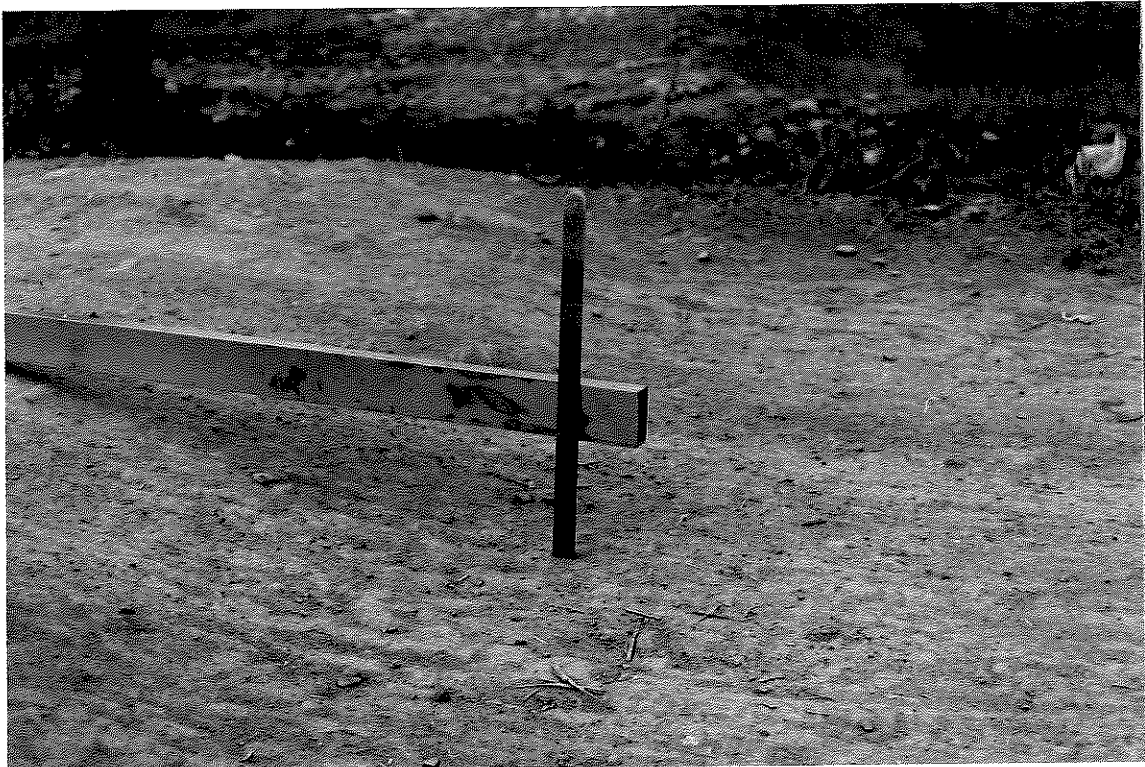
Dheri-Mallhu Road (Godo Link) showing damaged drain crossing the road
